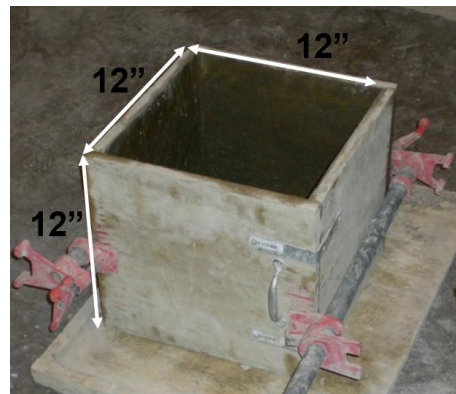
The Box Test Assembled with dimensions of 12 in (305 mm).
